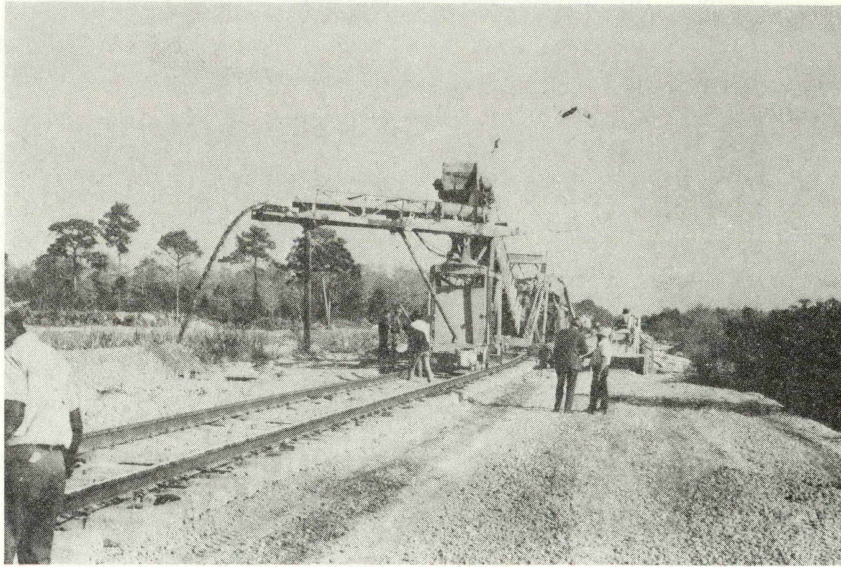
Replacement of soft and degraded ballast on one U.S. railroad. (2)
